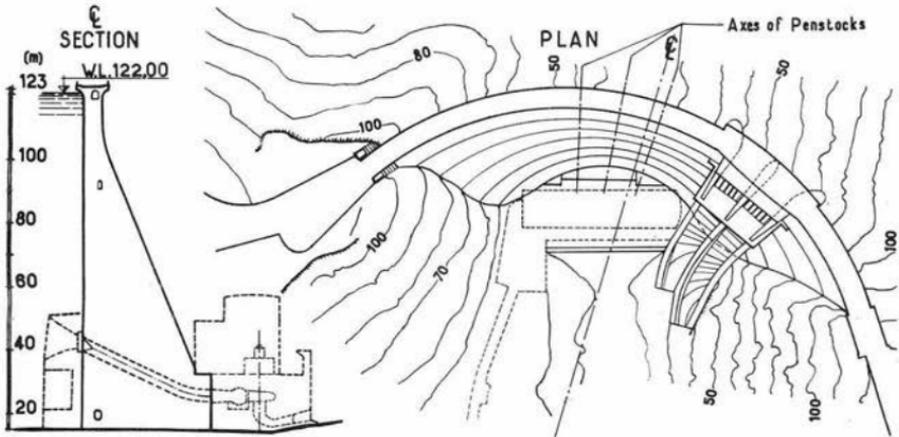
CASTELO DO BODE DAM. Plan and section.
